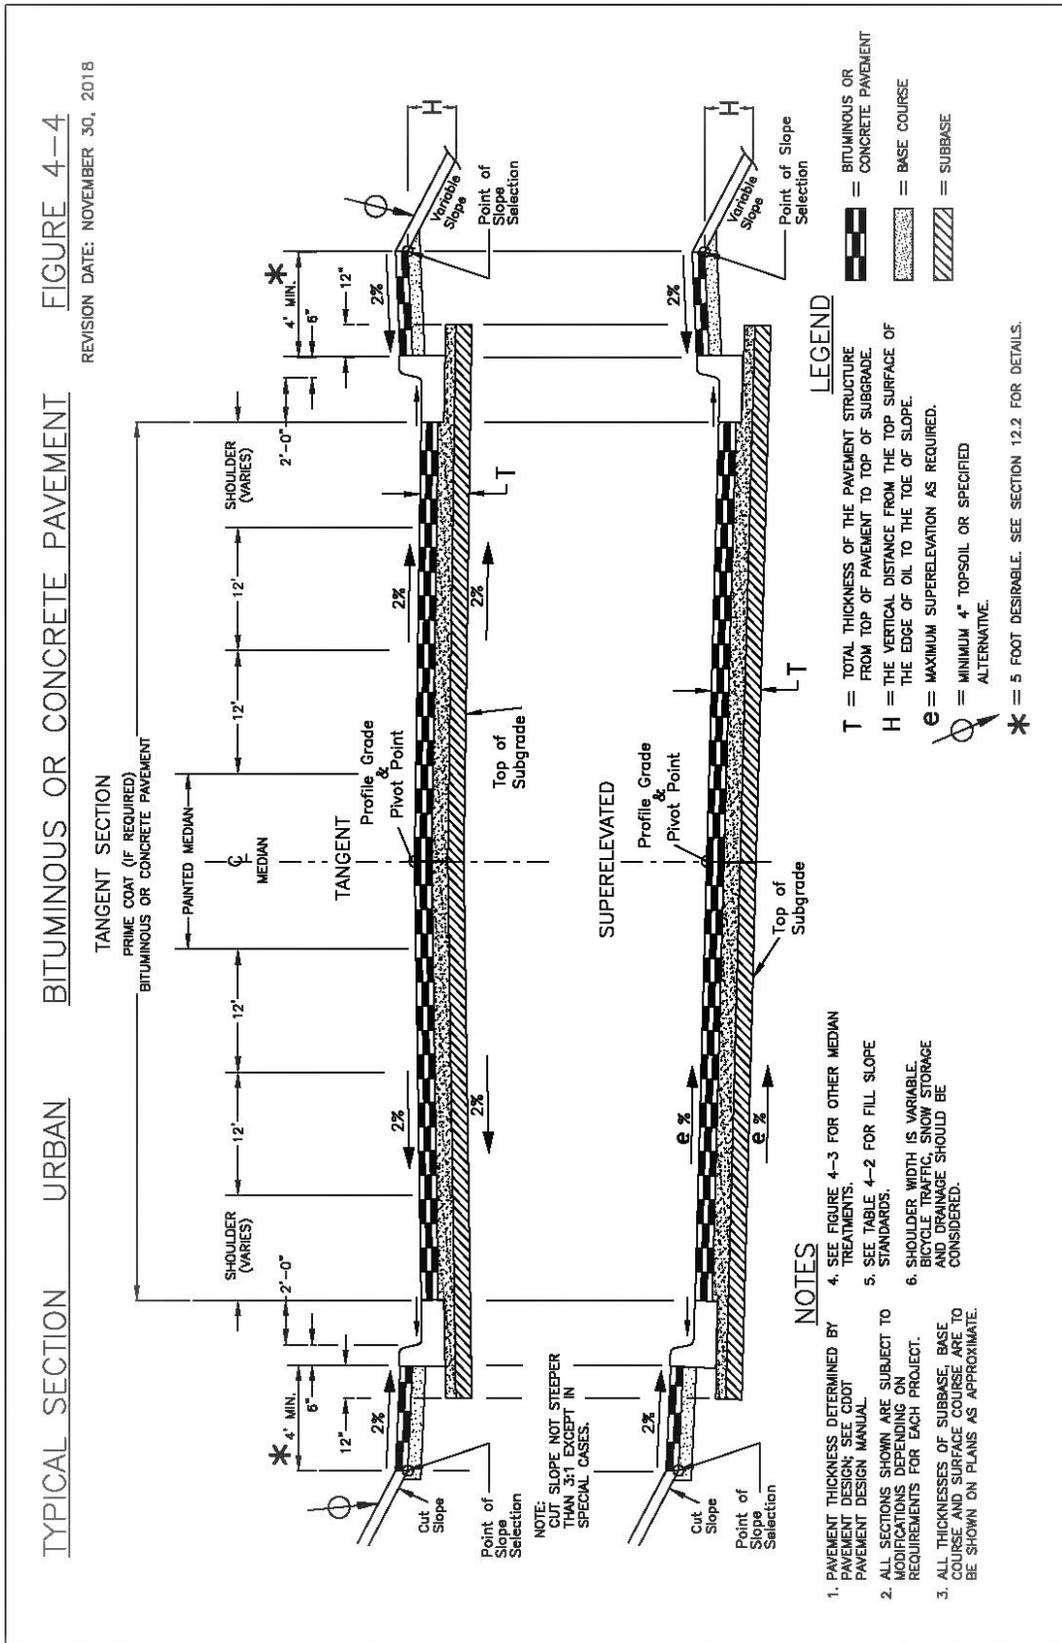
Typical Sections for Urban Bituminous or Concrete Pavement
